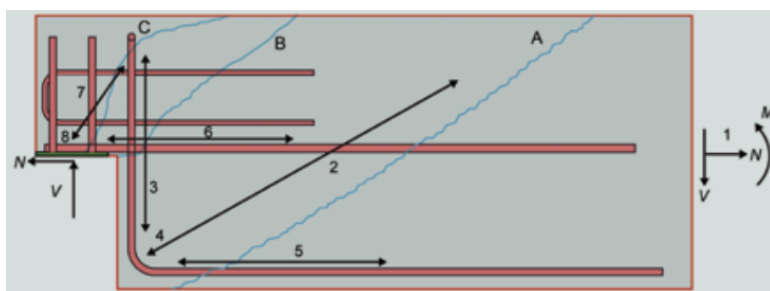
Reinforcement layout in dapped-end concrete beam [36]
